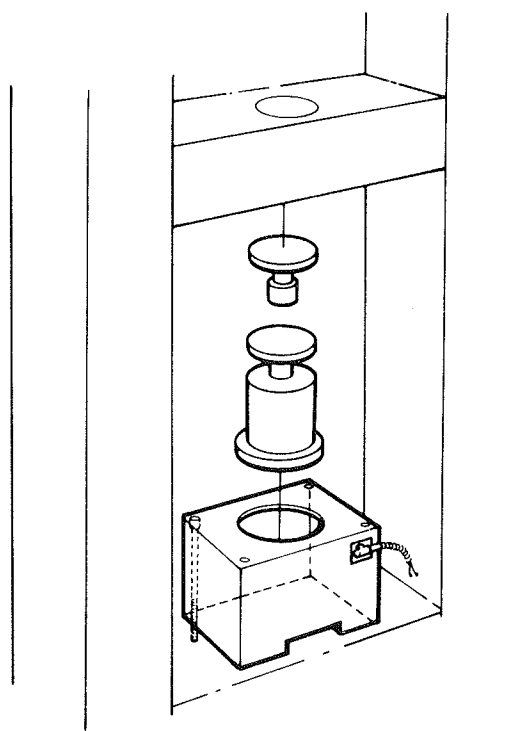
Compression Load Cell Installation in Overload Carriage
